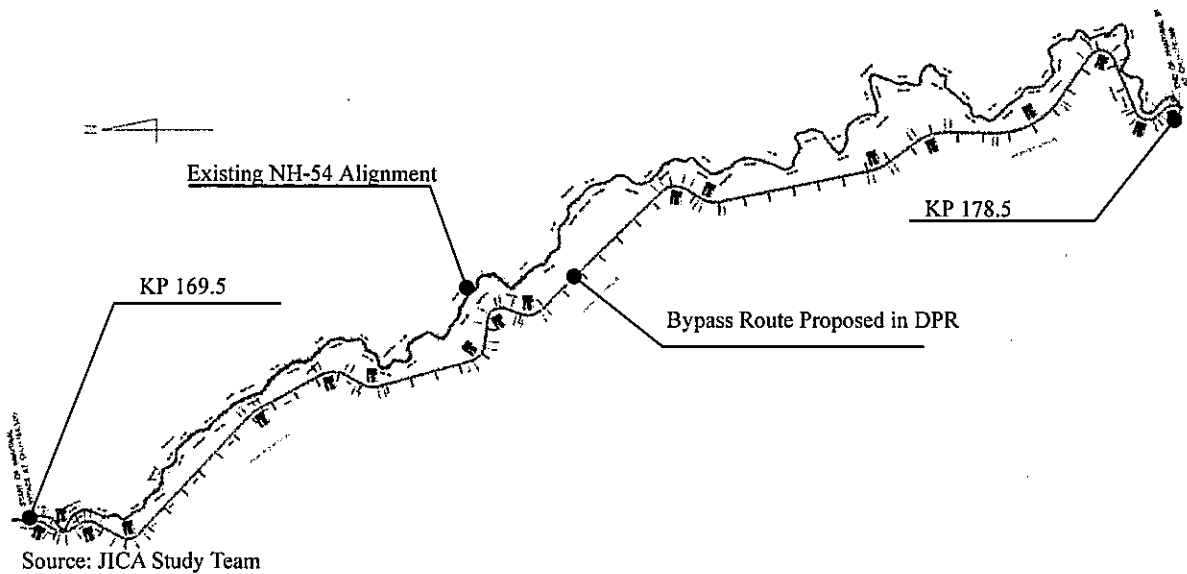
Hnathial Bypass Route Proposed in DPR
